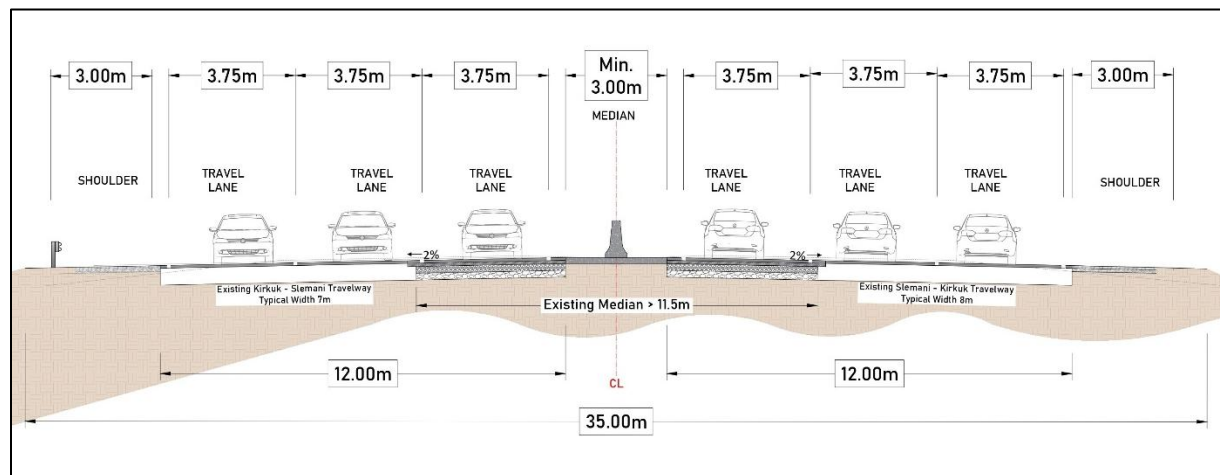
Typical Profile of Sulaymaniyah–Chamchamal–Kirkuk Road
